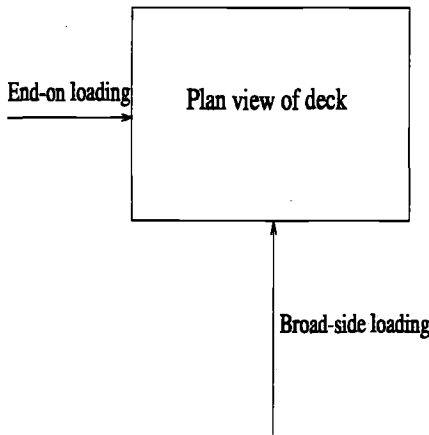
A plan view of deck w.r.t end-on and broad-side loading directions
